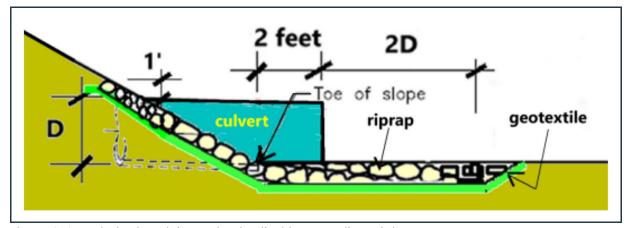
Typical culvert inlet/outlet detail with geotextile and riprap.
